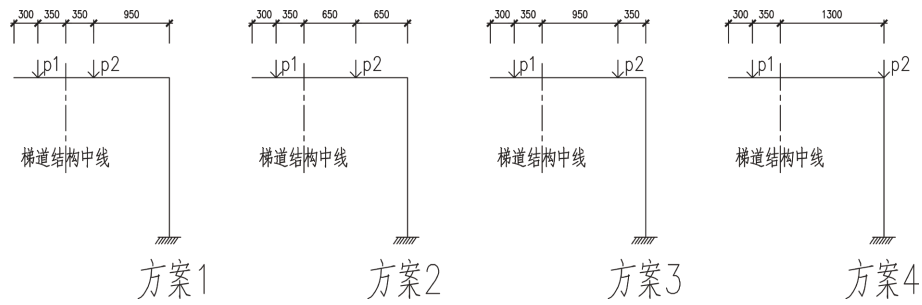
Layout scheme of T1-1 eccentric stair pier support
